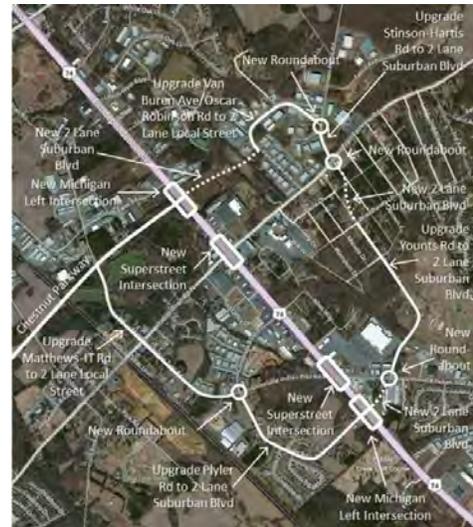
Future district revitalization area bounded by Chestnut Parkway, Stinson Hartis Road, Younts Road and Matthews-Indian Trail Road
